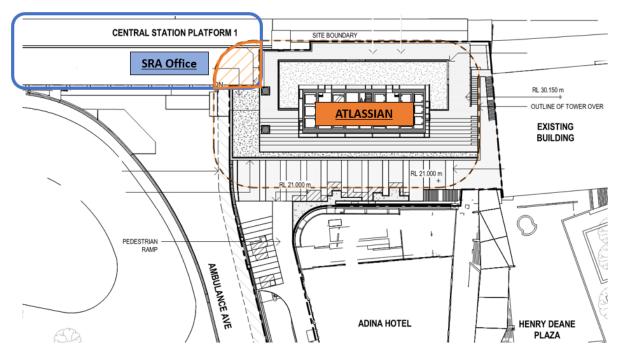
North-East Oversail Plan (SRA Office Below, Atlassian Level T1 Above)
